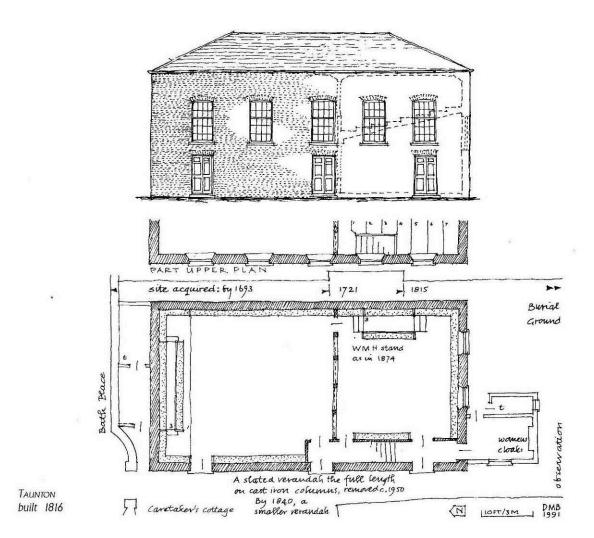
West elevation and original ground plan of the early nineteenth-century meeting house (Butler, vol. 2, p. 549)
